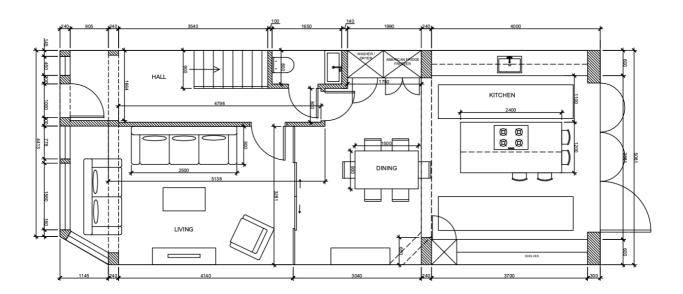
Ground-Floor Floor Plan (Not to Scale)
